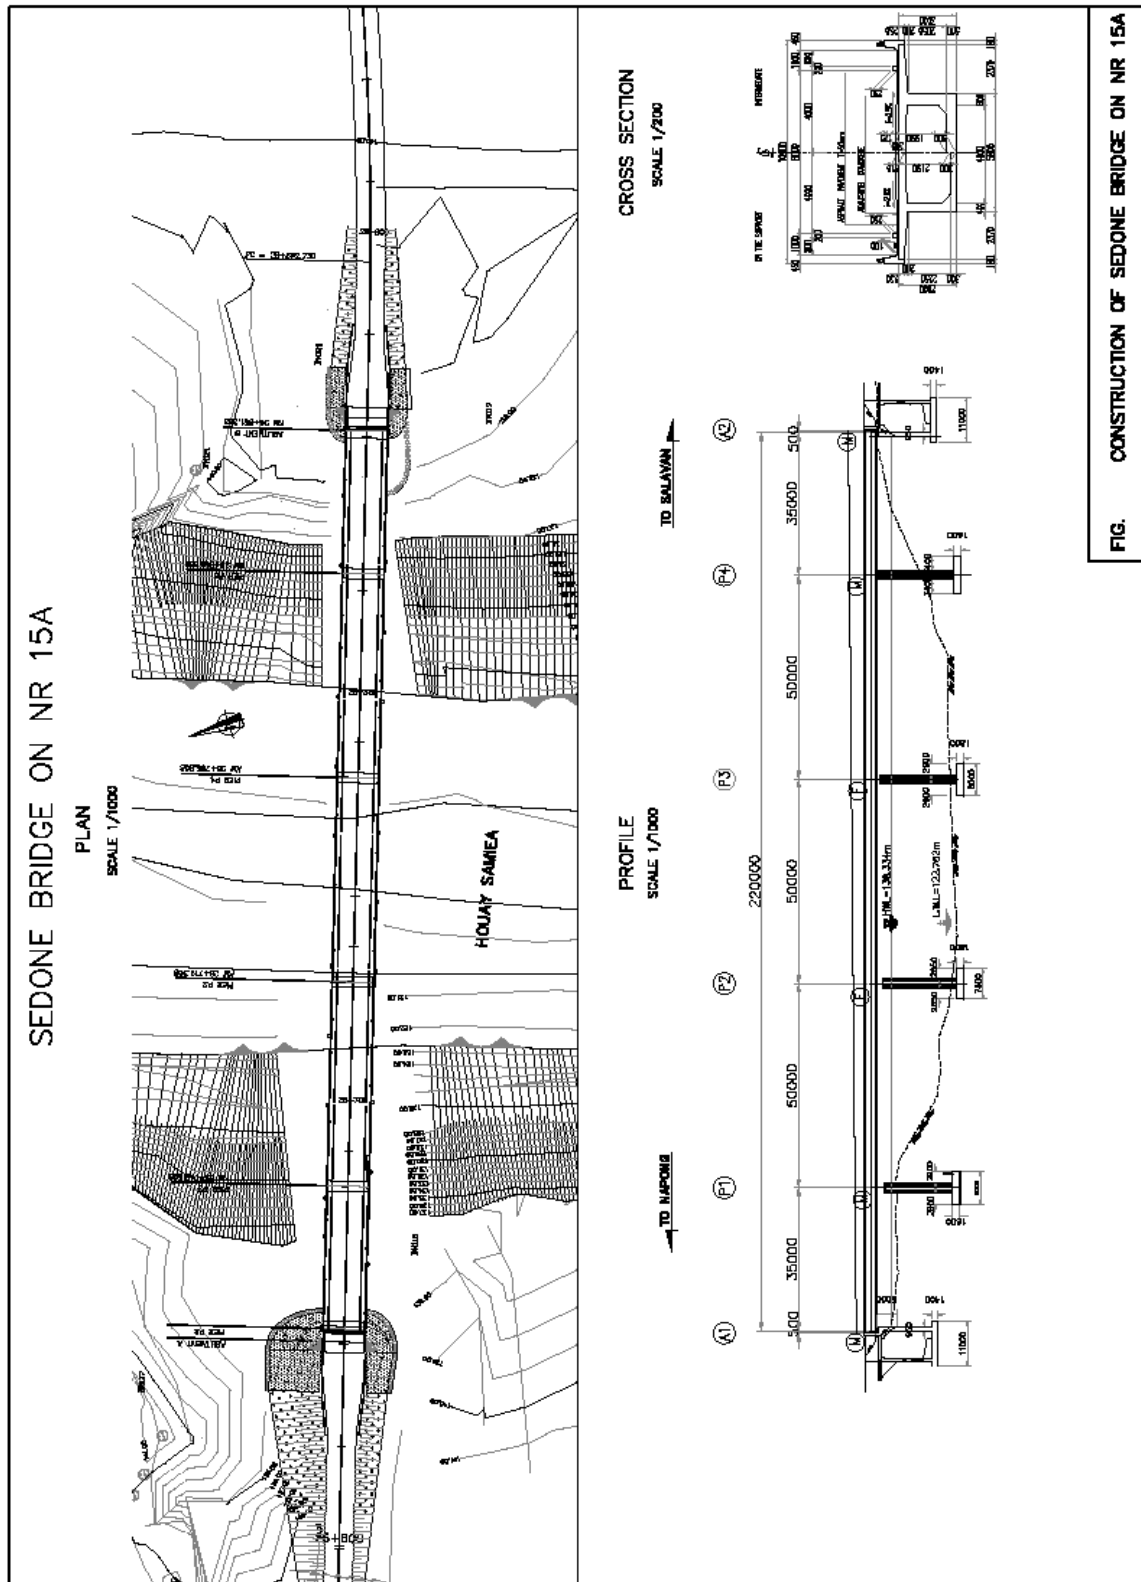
Plan and Profile (Construction of Sedone Bridge)
